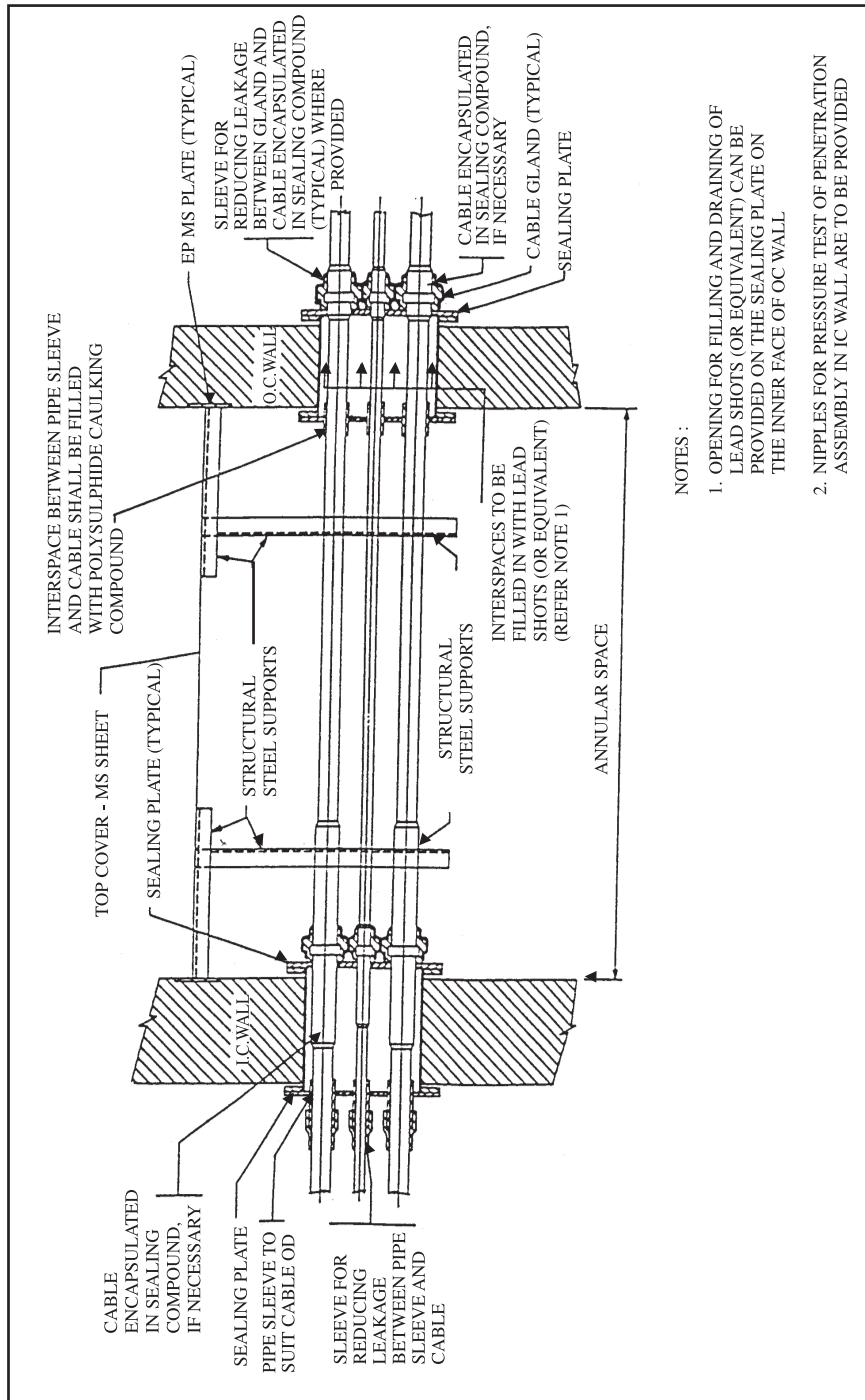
TYPICAL ARRANGEMENT OF CABLE SEALING AT OPENINGS IN REACTOR BUILDING ICW AND OCW
